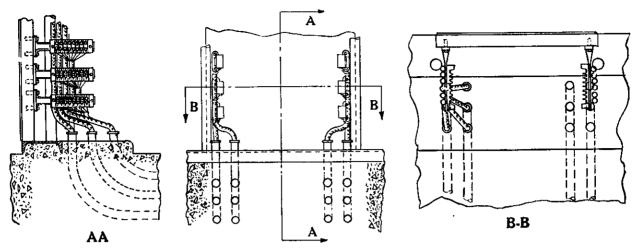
Method of Terminating Conduits Entirely Embedded in Concrete Excepting the Elbow Ends which Extend a Few Inches Above Floor. Switchboard Mounted on Pipe Frame.
